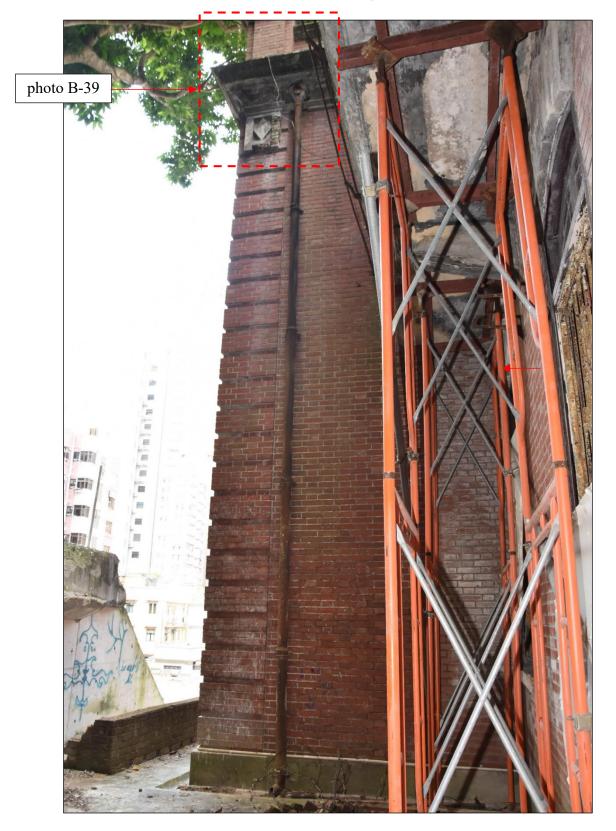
Main Building, the cast iron rainwater downpipe with hopper on the top installed at north-west elevation (facing Admiralty side)
